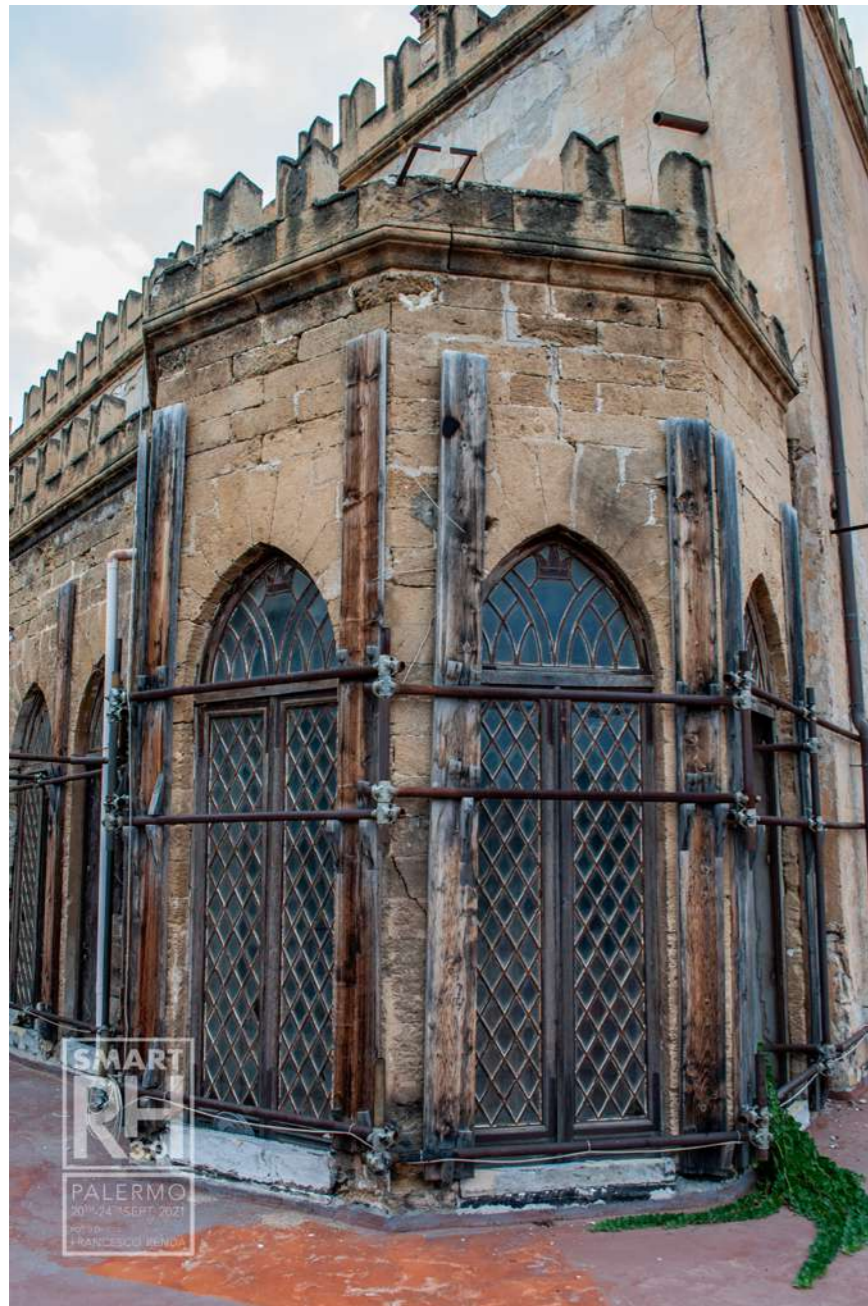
Consolidation and reinforcement systems in the façade of palace tower. © Francesco Renda
